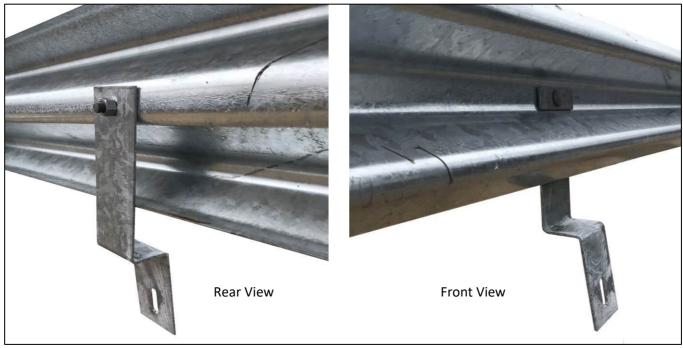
Attachment of BikerShield™ Mounting Bracket to W-Beam
